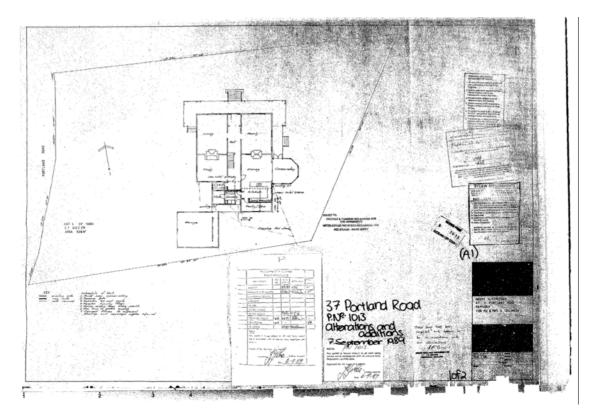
Plan showing the ground floor layout of Glenholm in 1989 during which time proposals were submitted for the erection of a conservatory on the east elevation and modifications to the positioning and layout of the kitchen (B/1989/3718 – Building Consent Plan – O/1013/05, Auckland Council property file: 37 Portland Road, Remuera).
